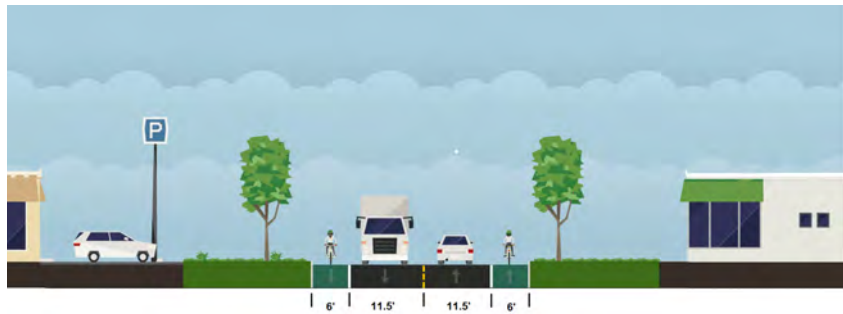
(a) - Proposed Cross-section: Davis Street Bike Lane Concept (On-street parking retained)
